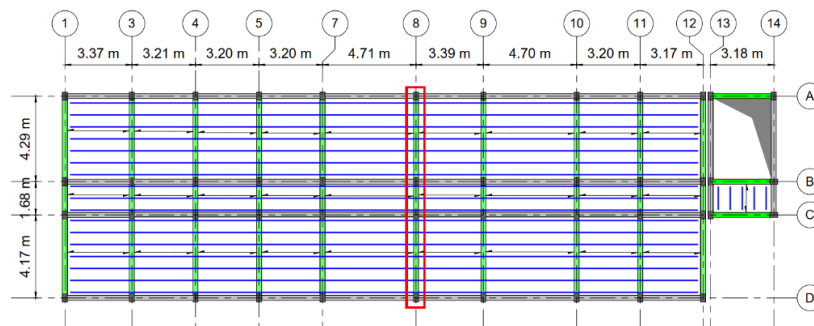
23. Principal beam on axis 8 of the structural framing plan
